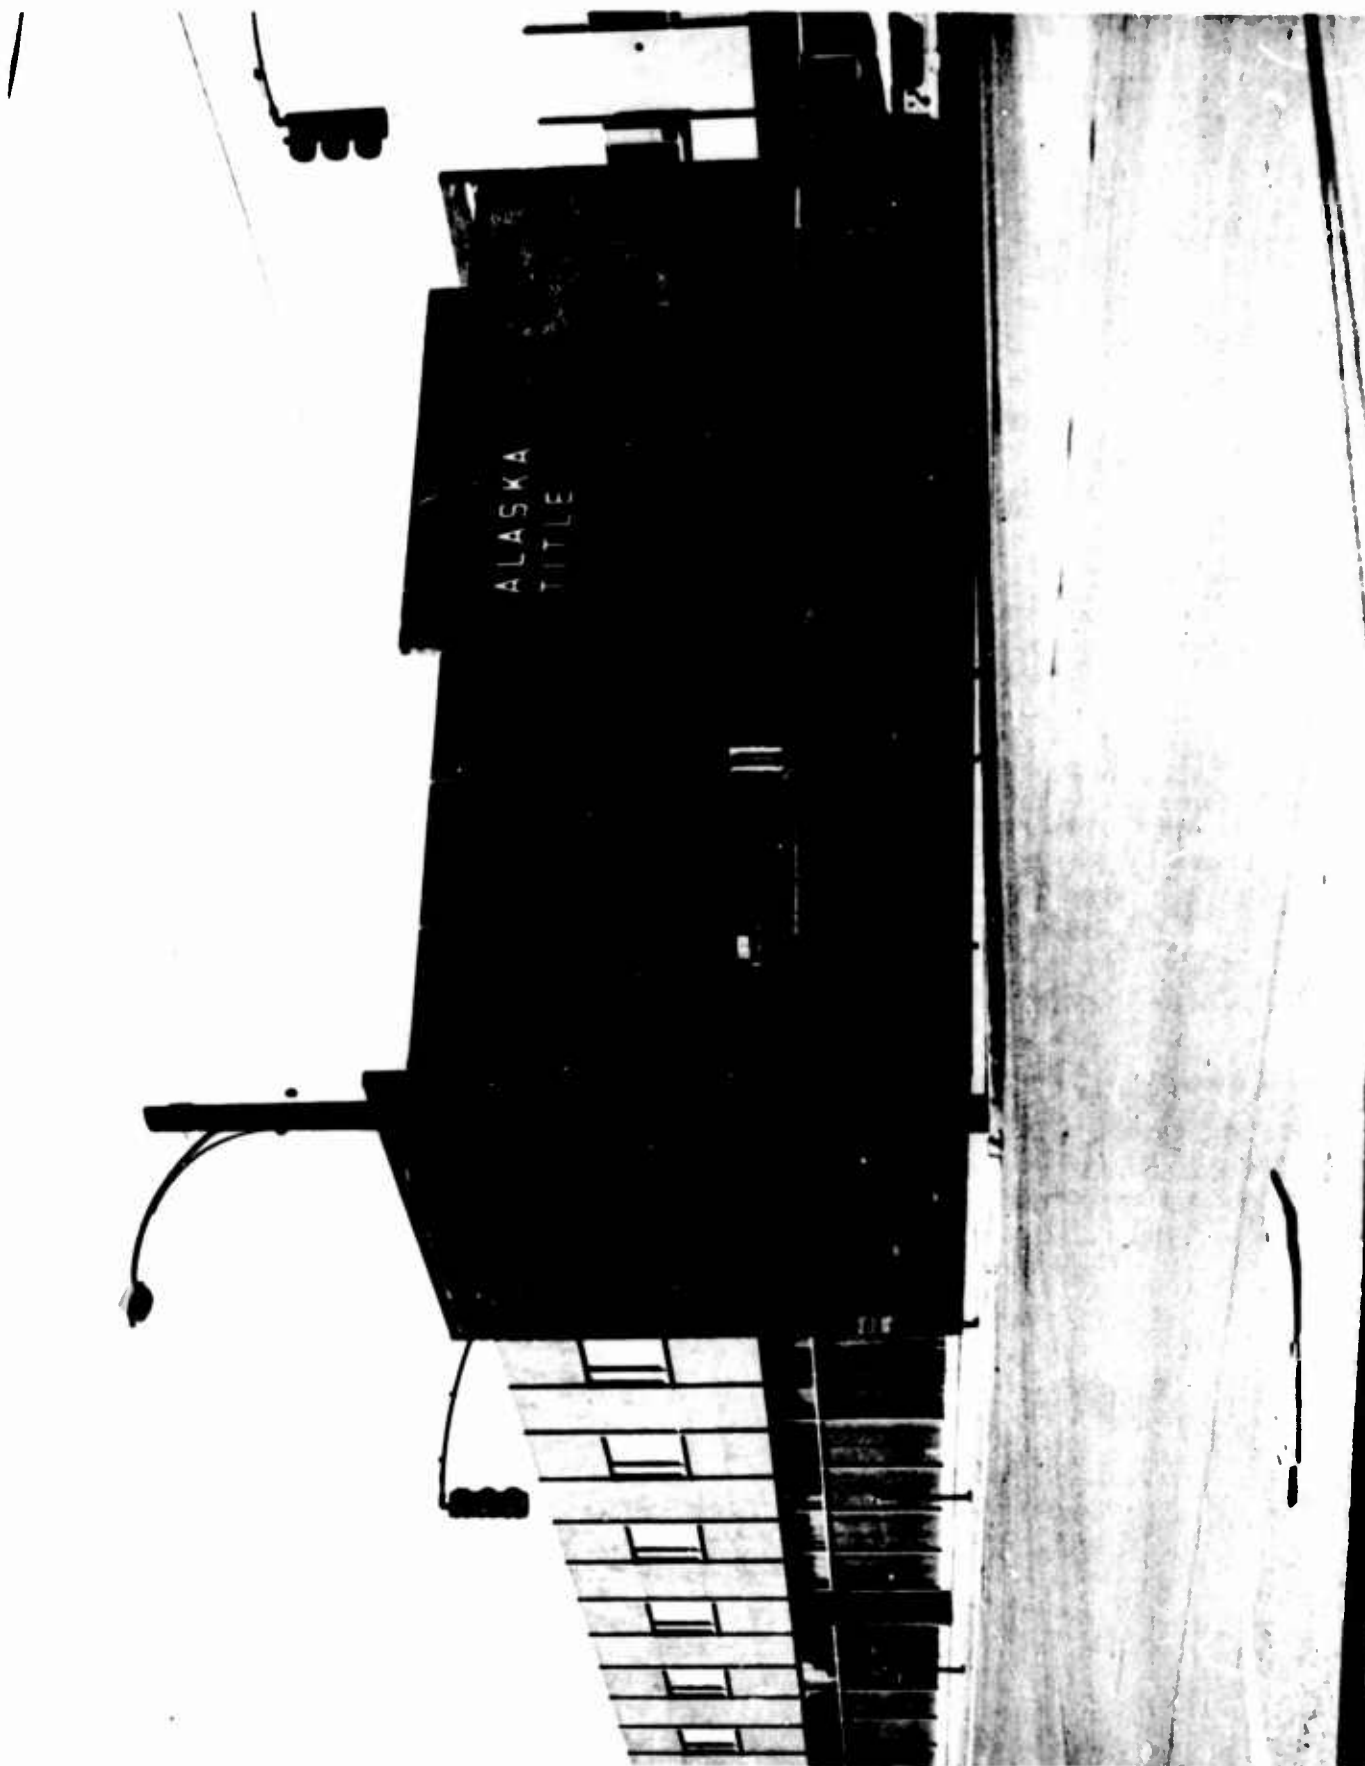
L Street Slide (Commercial building at Sixth Avenue and E Street. No damage apparent.
